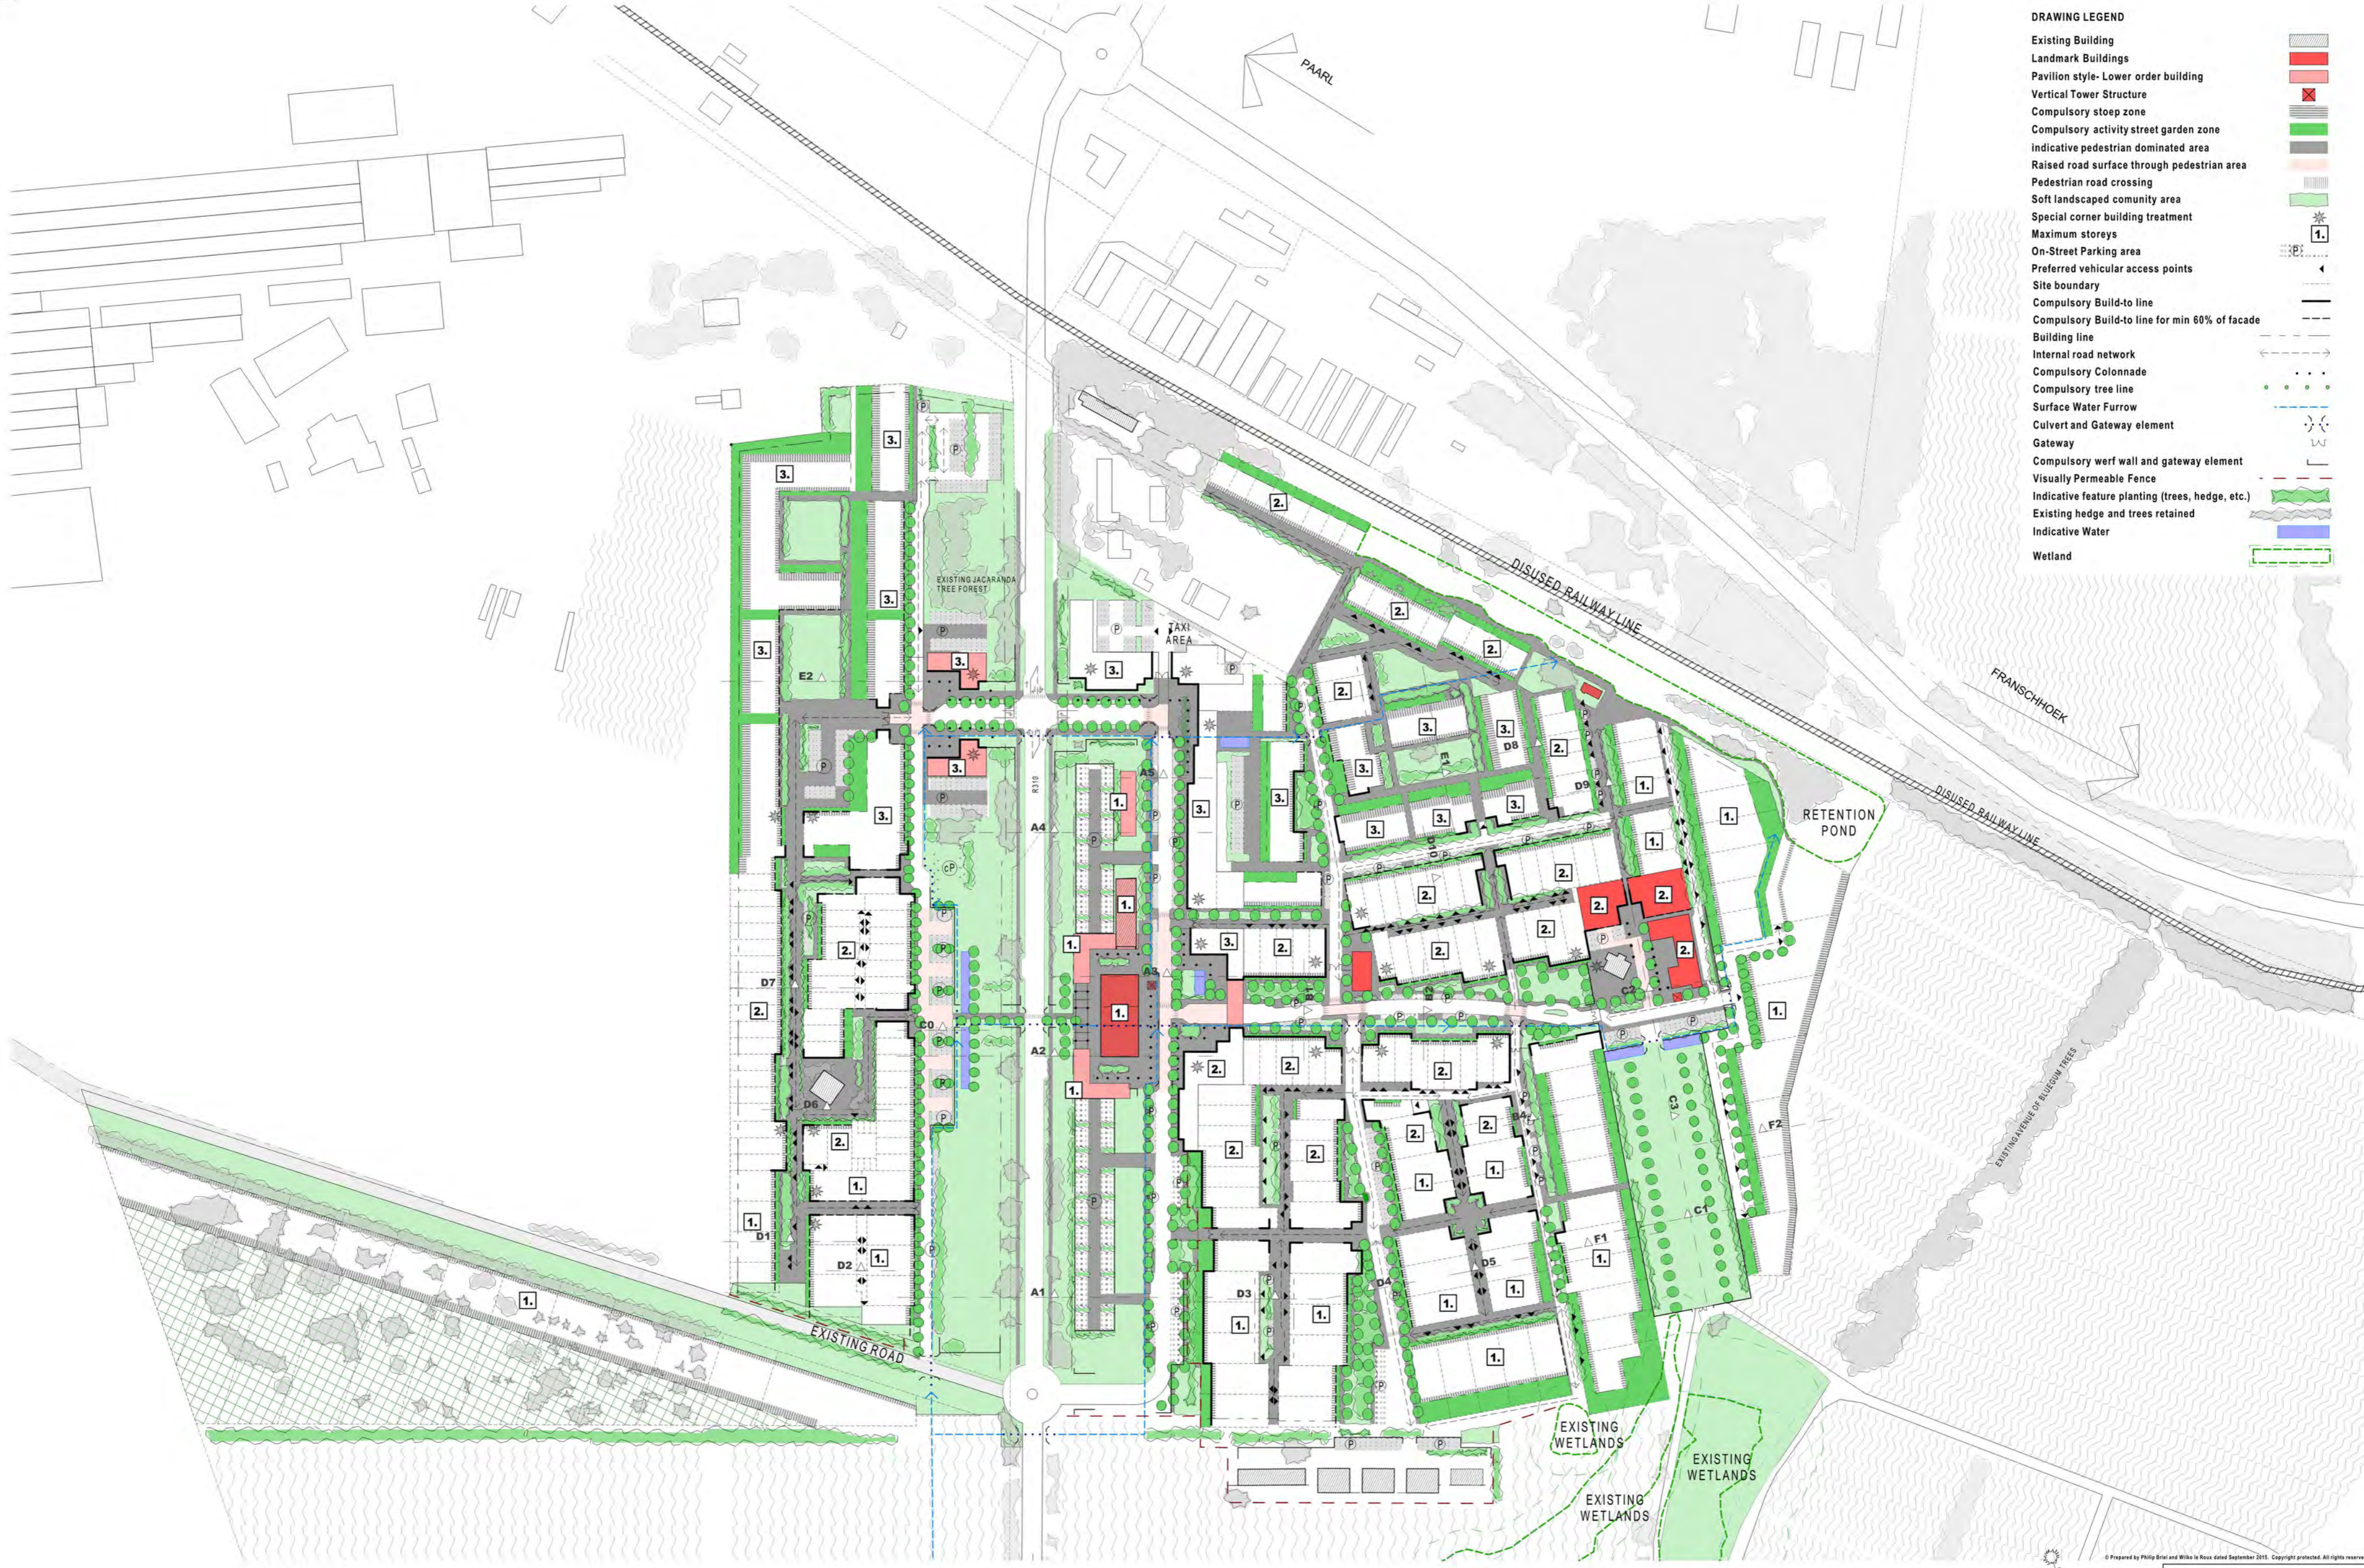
Site Development Plan | scale 1:3000 @ A3
